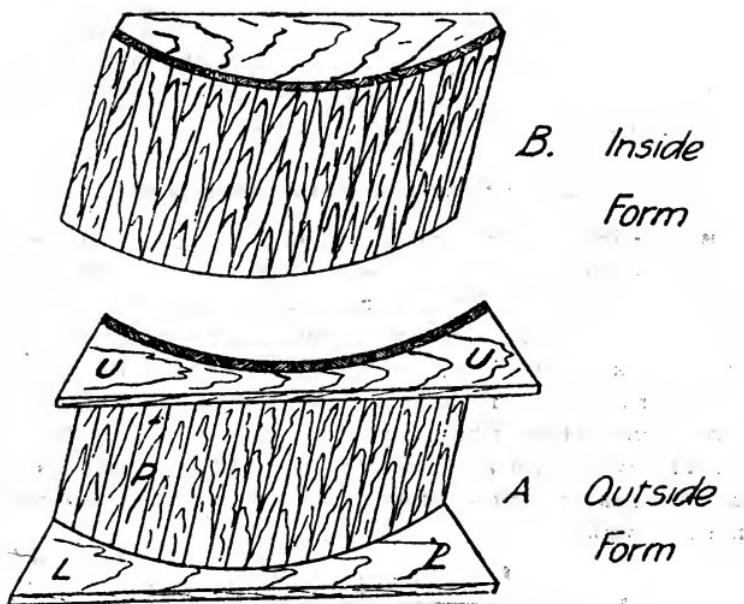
Illustrates method of making form for constructing concrete walls. The forms are made of plank and are made in sections 4 to 10 feet long, requiring 5 to 8 sections to complete the circle.
